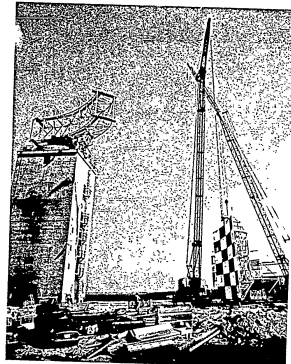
Preparing one of the fully assembled 8000-lb reflector tips for lifting and installation to center section.
